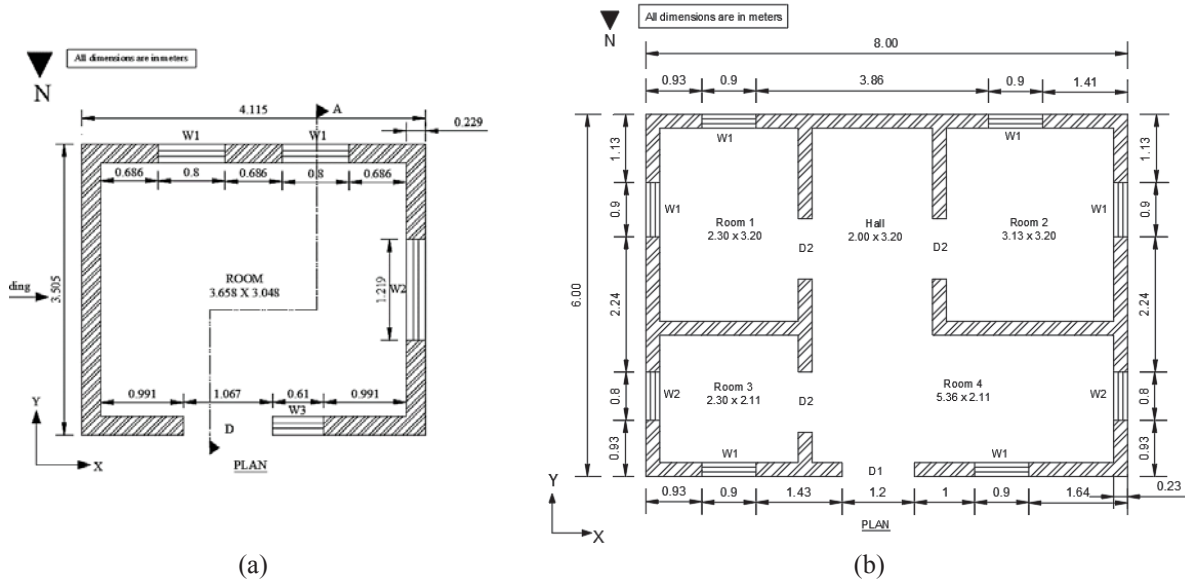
Plan view of URM buildings: (a) URM1; (b) URM2 and URM3.
